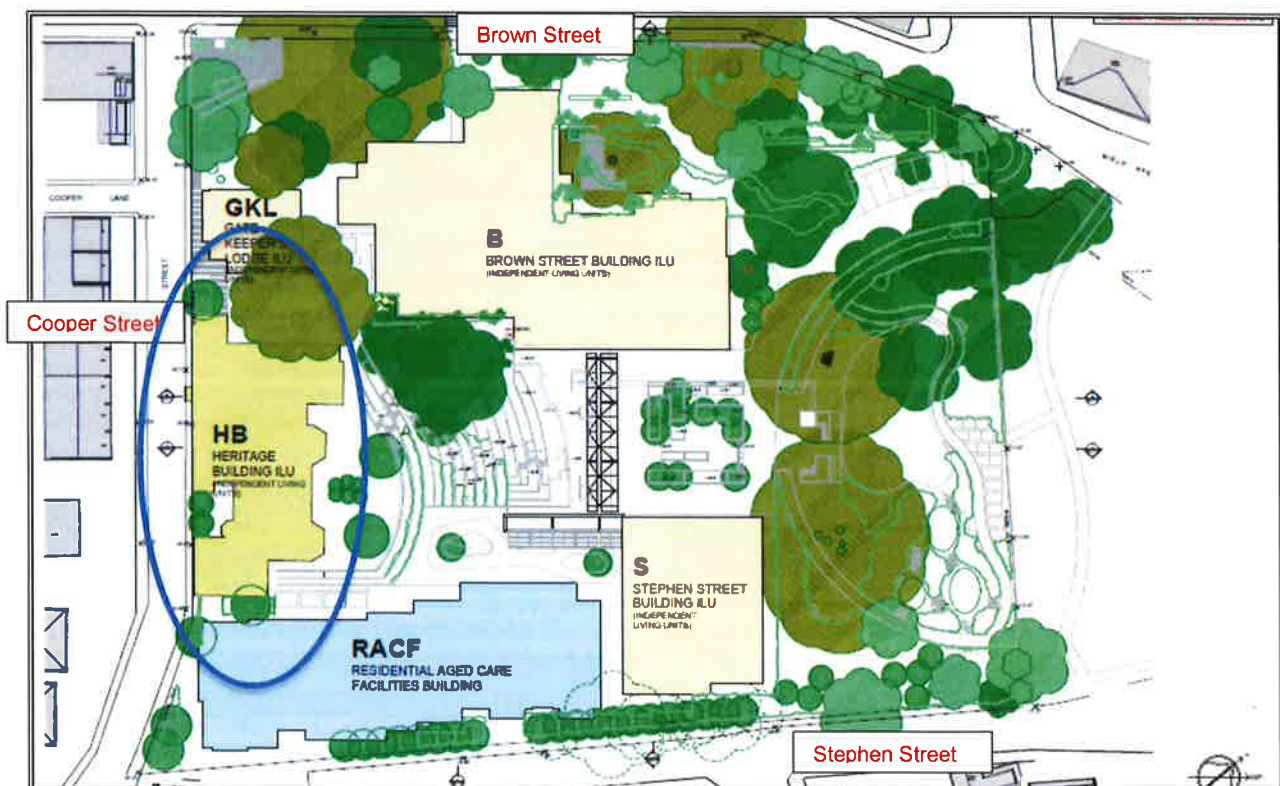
Key plan, showing the heritage listed Scottish Hospital building in blue (Source: Adapted from the Proponent's EA Report)
